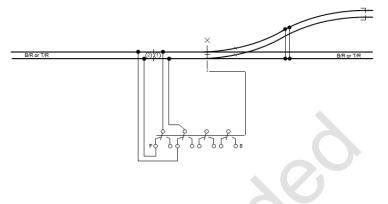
(a)-7: SCC Circuit Plan - Wiring Details
